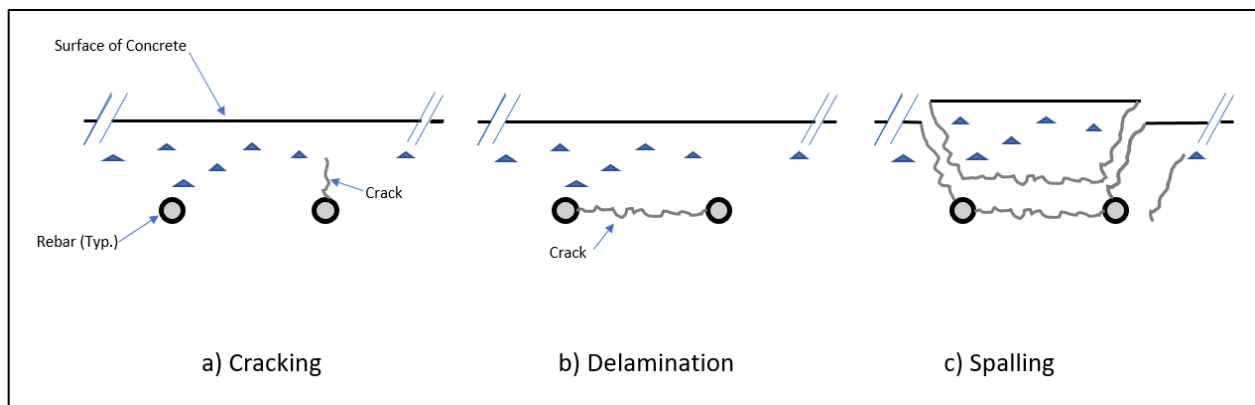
Progression of distress in reinforced concrete due to corrosion of reinforcing steel
